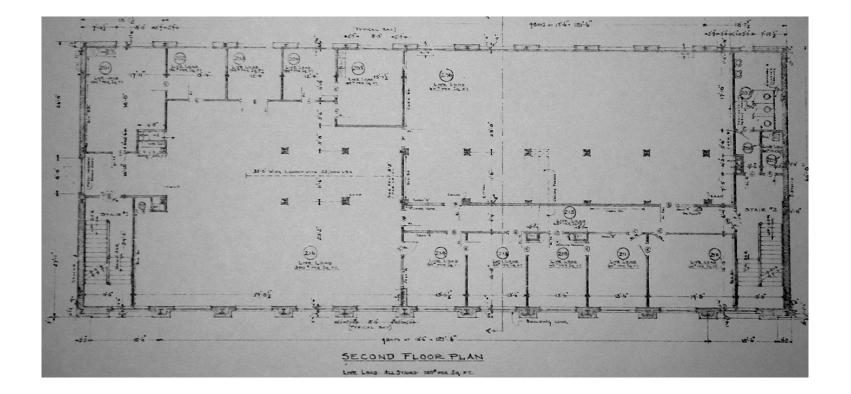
Photo of the Second Floor Plan of the Guggenheim Laboratories.
